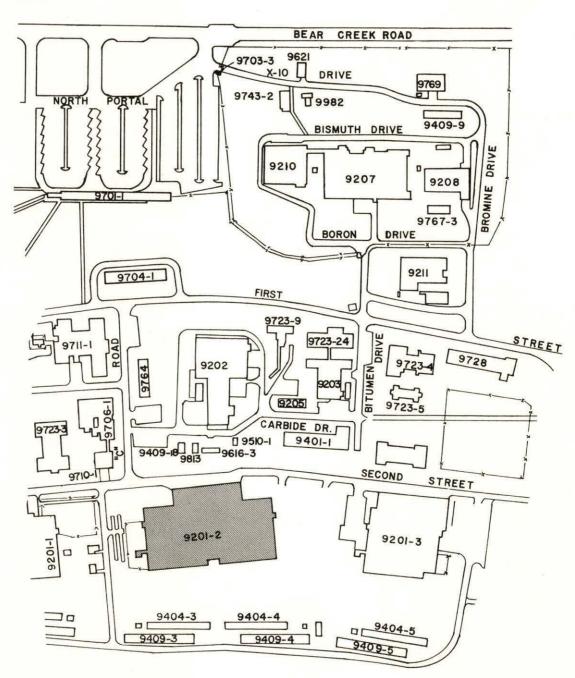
PLOT PLAN SHOWING LOCATION OF BUILDING 9201-2.
